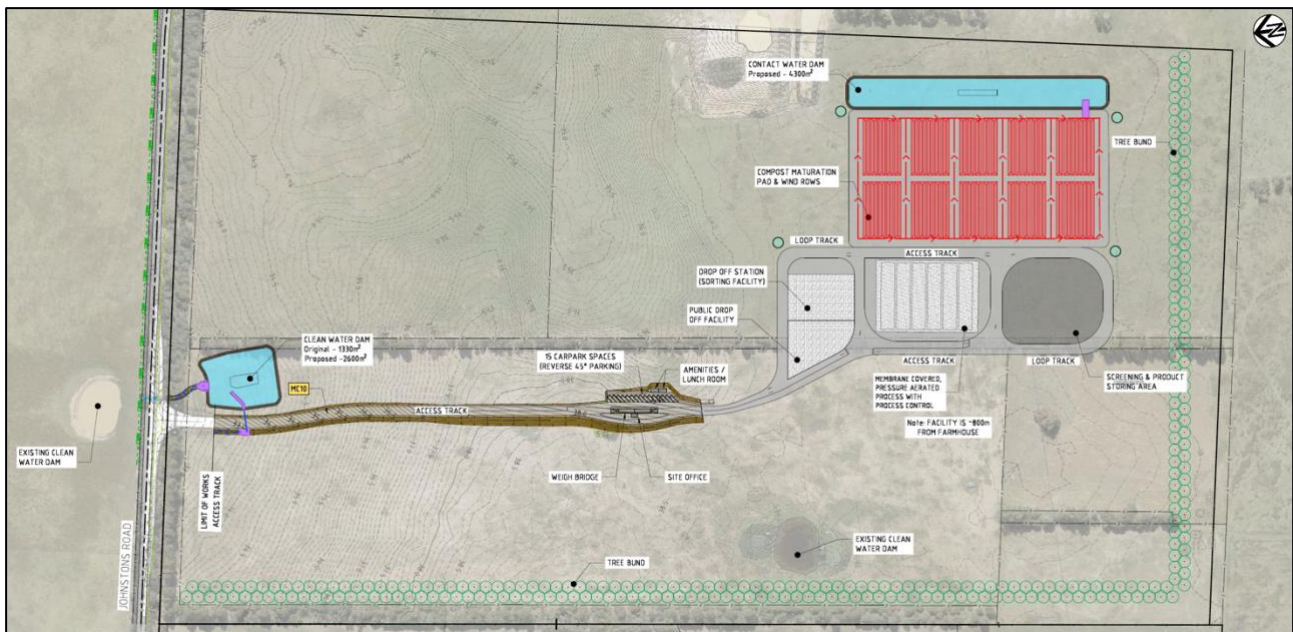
Finalised site plan for the facility (Source: East Gippsland Shire Council plans, completed by SMEC)
